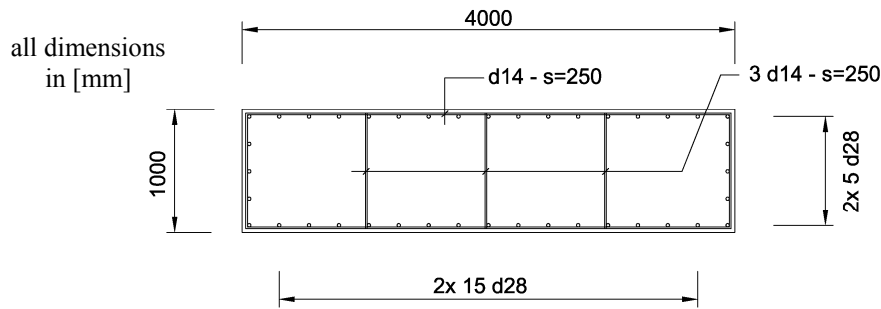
Cross-section of pier at bridge over railway on west-bypass Gossau (SG)
